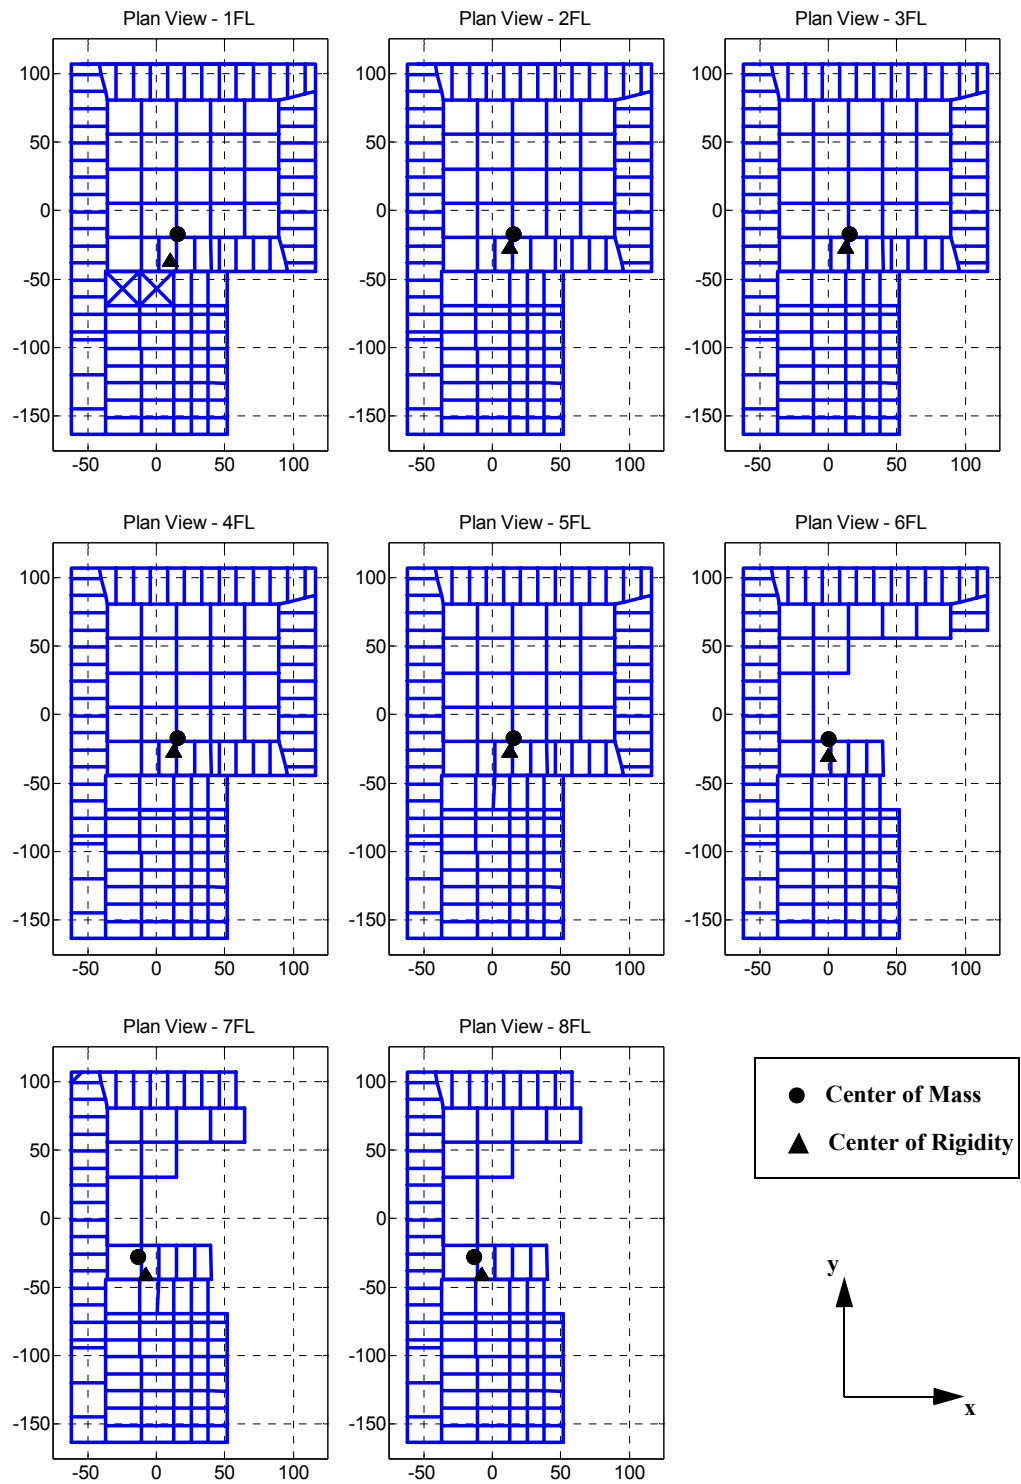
Plan View of the 8-story L-shaped Building.
